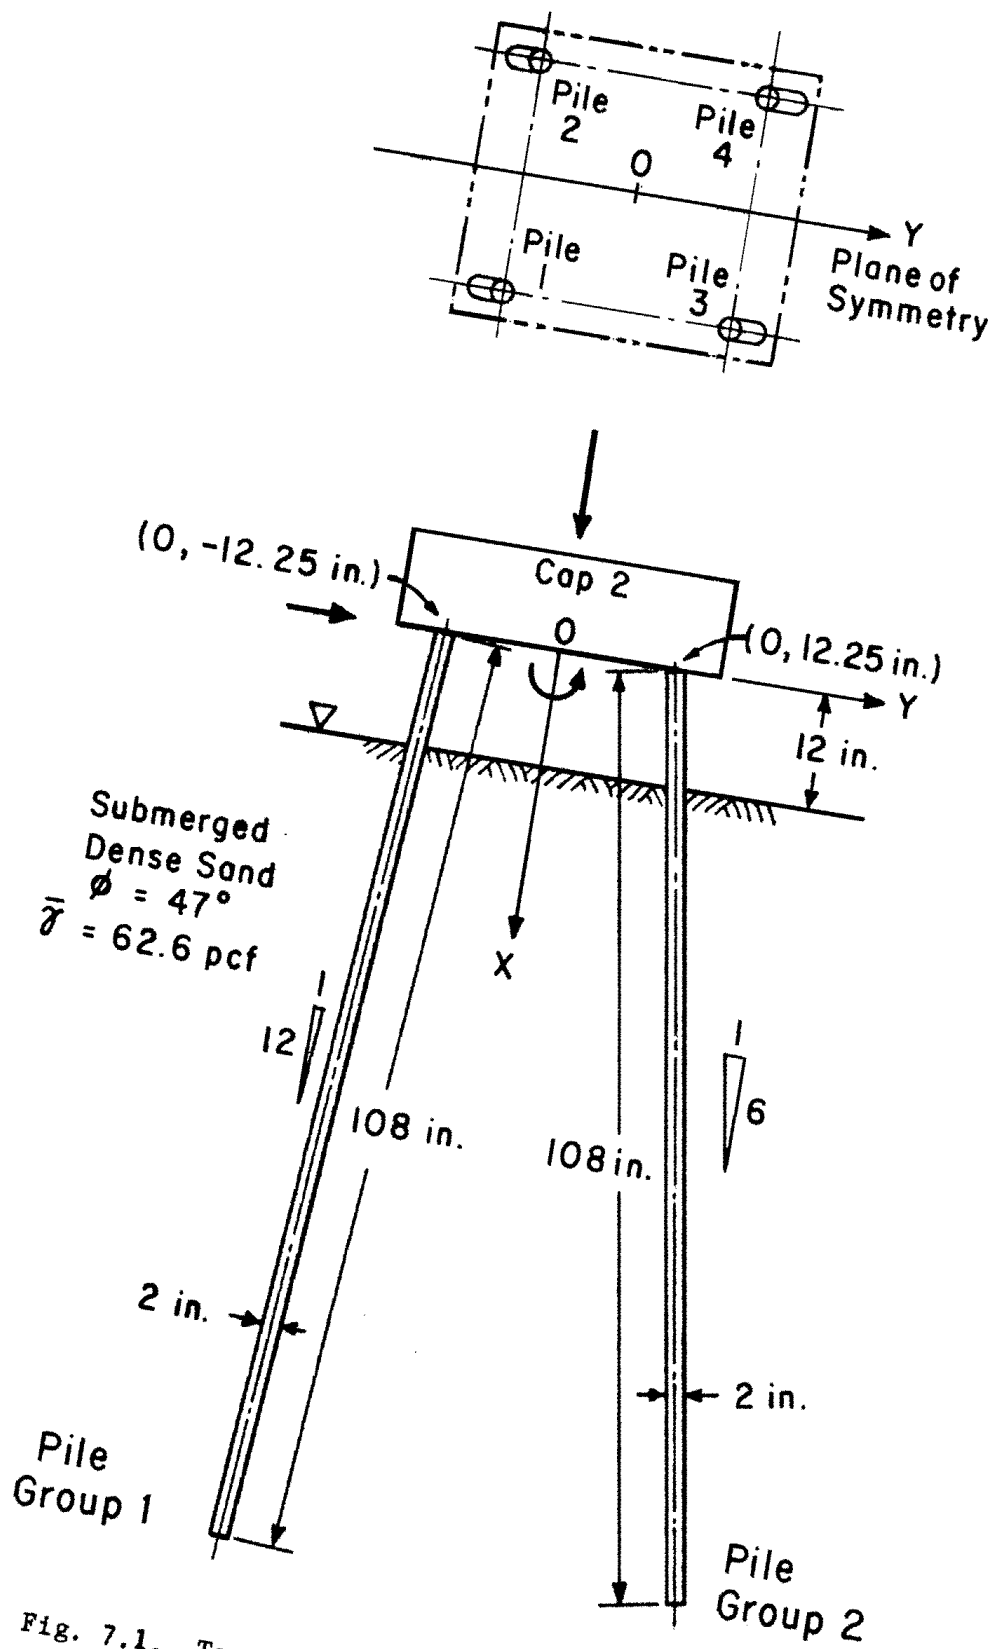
Test Grouped Pile Foundation, Cap 2
